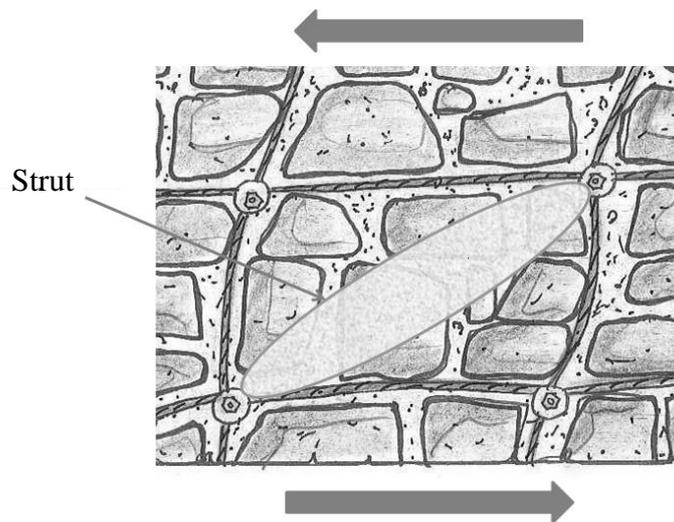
Strut-and-tie model for a reinforced portion of a wall subjected to an in-plane load.
